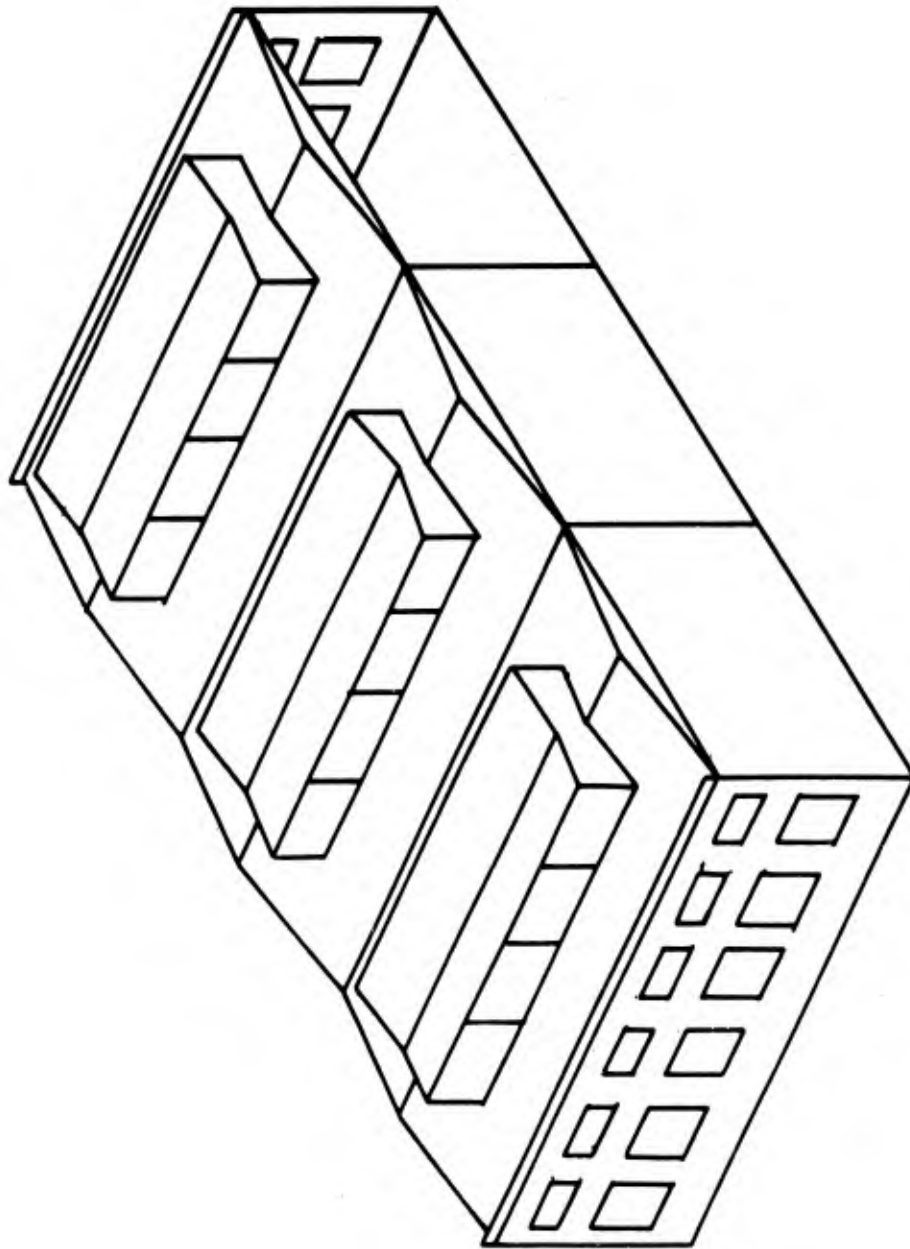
Isometric of Building 3.3.3 (Wing Walls not Shown)
